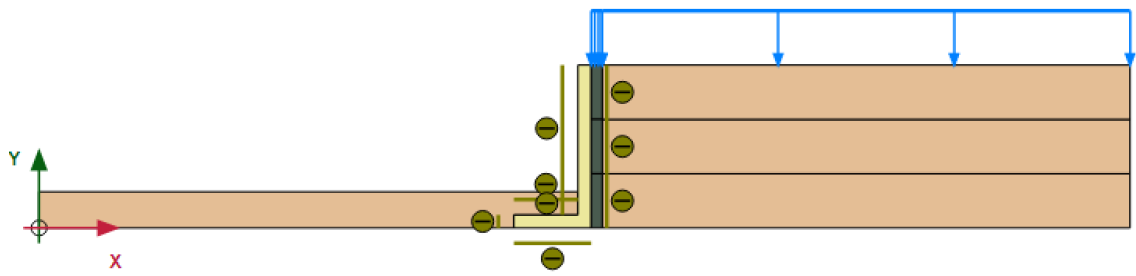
Retaining wall with no backfill slope and 0.3m width TDA backfill
